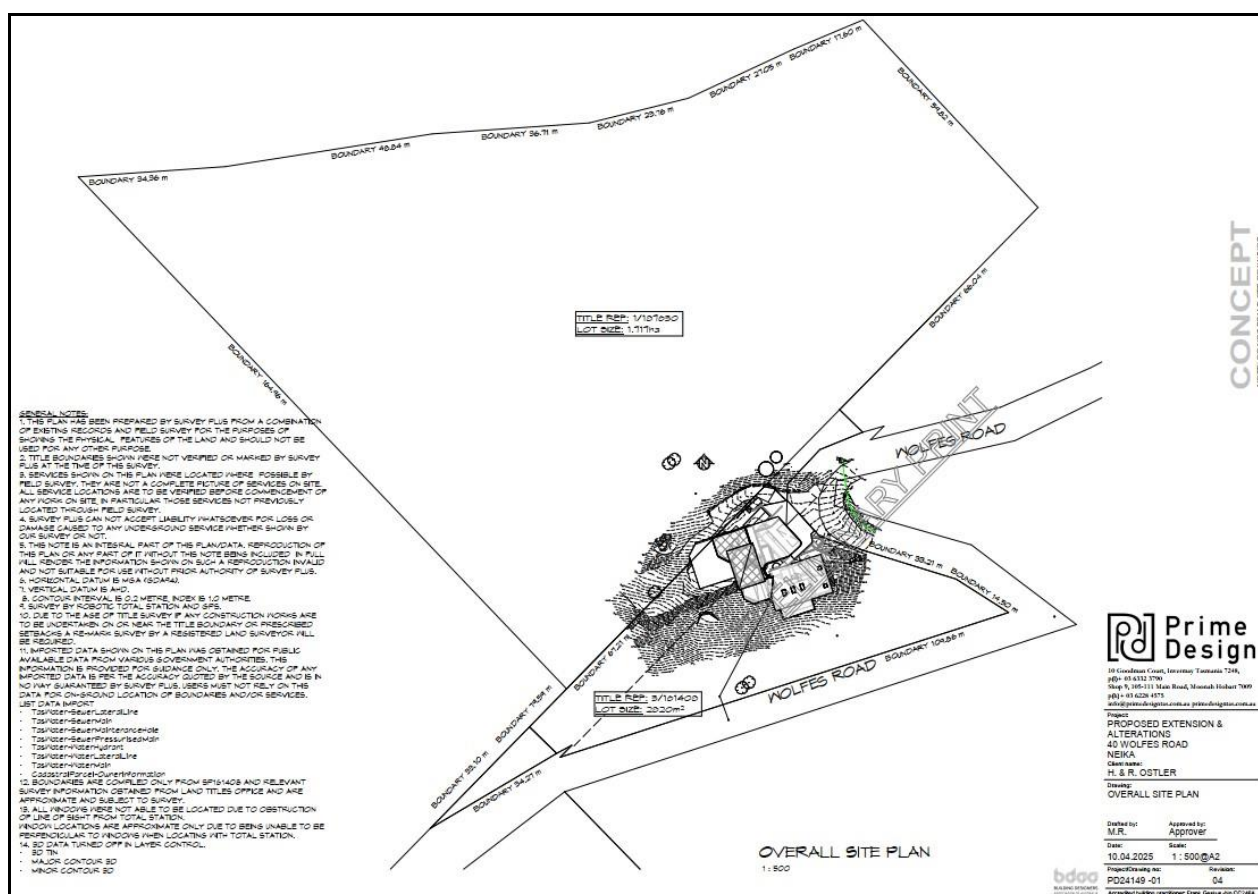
Site plan showing proposed location of the development site (Ref: Prime Design, Proposed Extension & Alterations, 40 Wolfes Road, Neika, H. & R. Ostler PD24149 REV 04).
